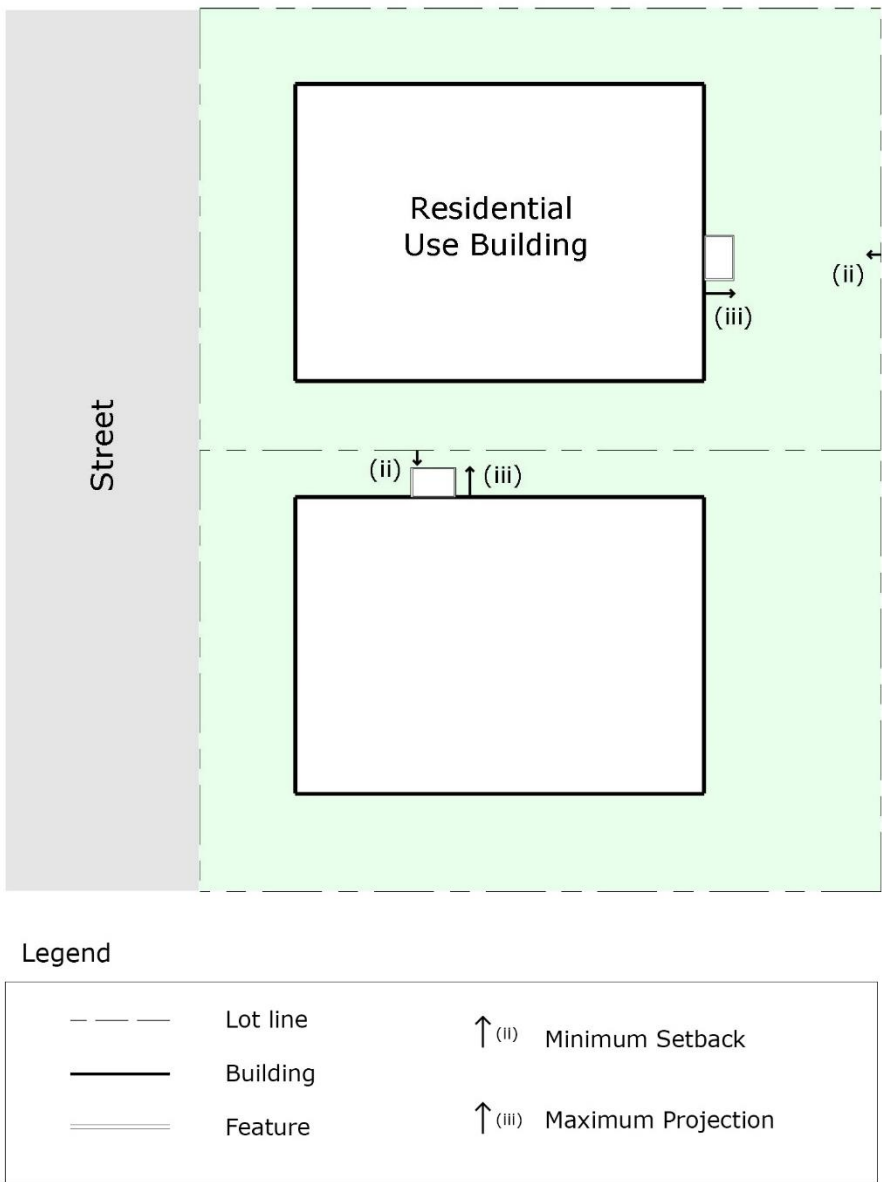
demonstrates the maximum permitted projection and the minimum required setback for heating and cooling systems and permanent generators for residential use buildings in the top image or in a yard abutting a residential use building in the bottom image.
